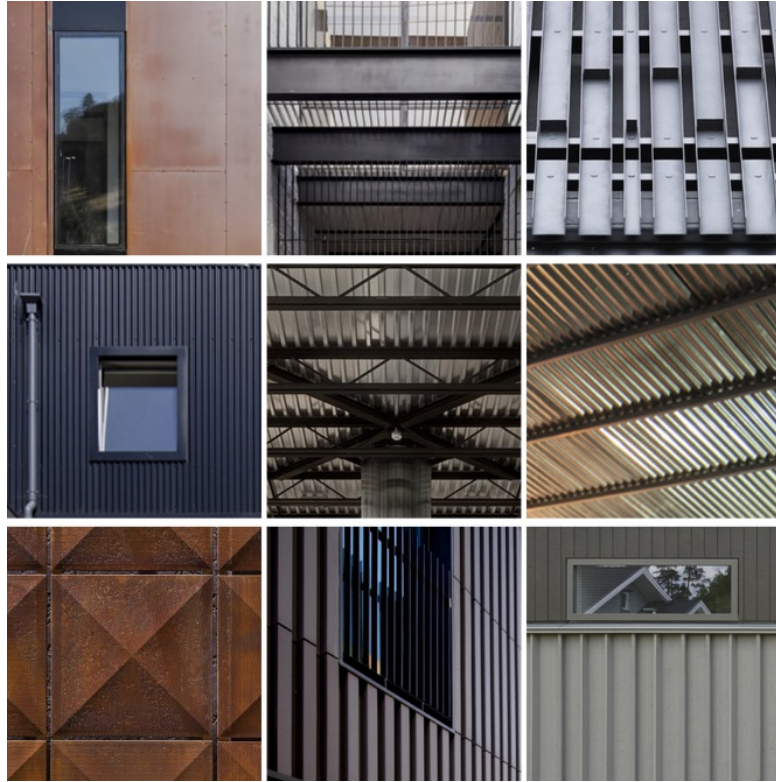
Metal-clad usage in buildings. (Source: Gallery of 15 details of metal structures and facades for residential projects - 1. ArchDaily. (n.d.). Retrieved April 27, 2023, from <https://www.archdaily.com/799868/15-details-of-metal-structures-and-facades-for-residential-projects/580a7b13e58ece844400003e-15-details-of-metal-structures-and-facades-for-residential-projects-image>)
